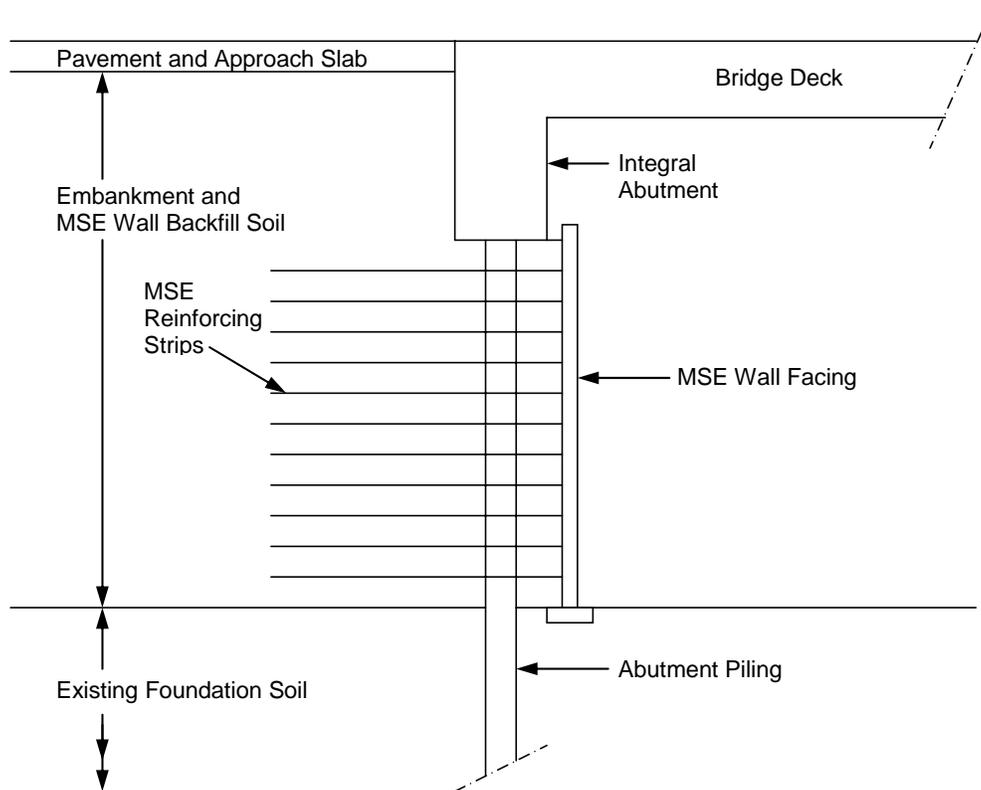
Profile view of MSE system around piling supporting integral bridge abutment.
